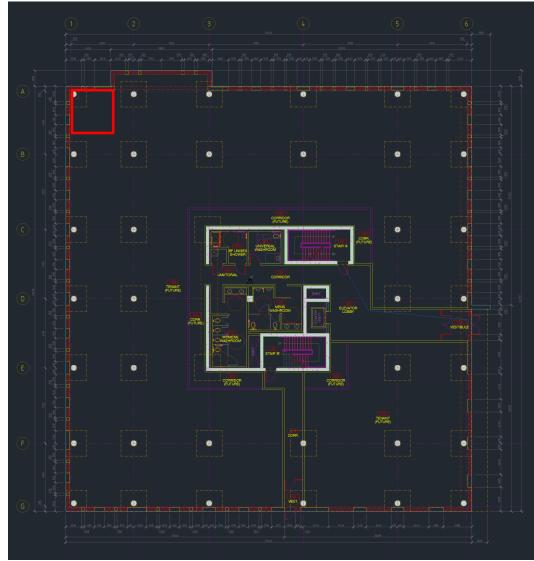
Floor Plan of the ground floor showing the Plane of Window Point of Reception POR1.
